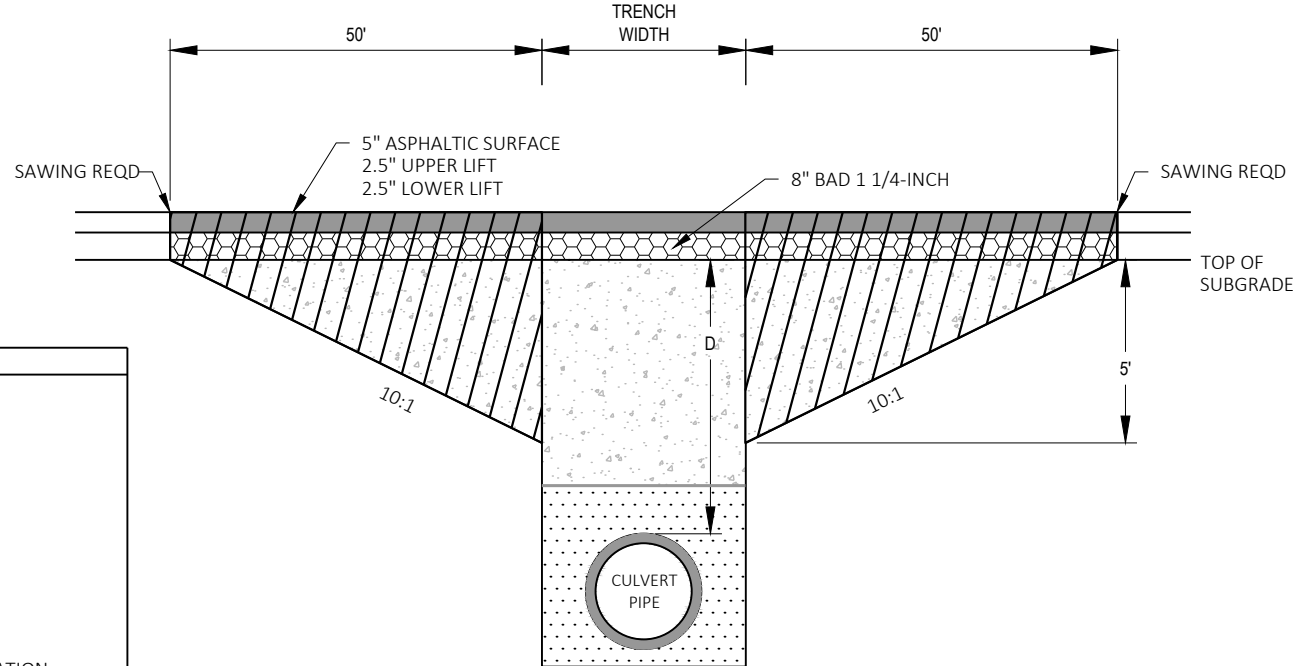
DETAIL FOR GRADING AT CULVERT PIPE EXTENSIONS
